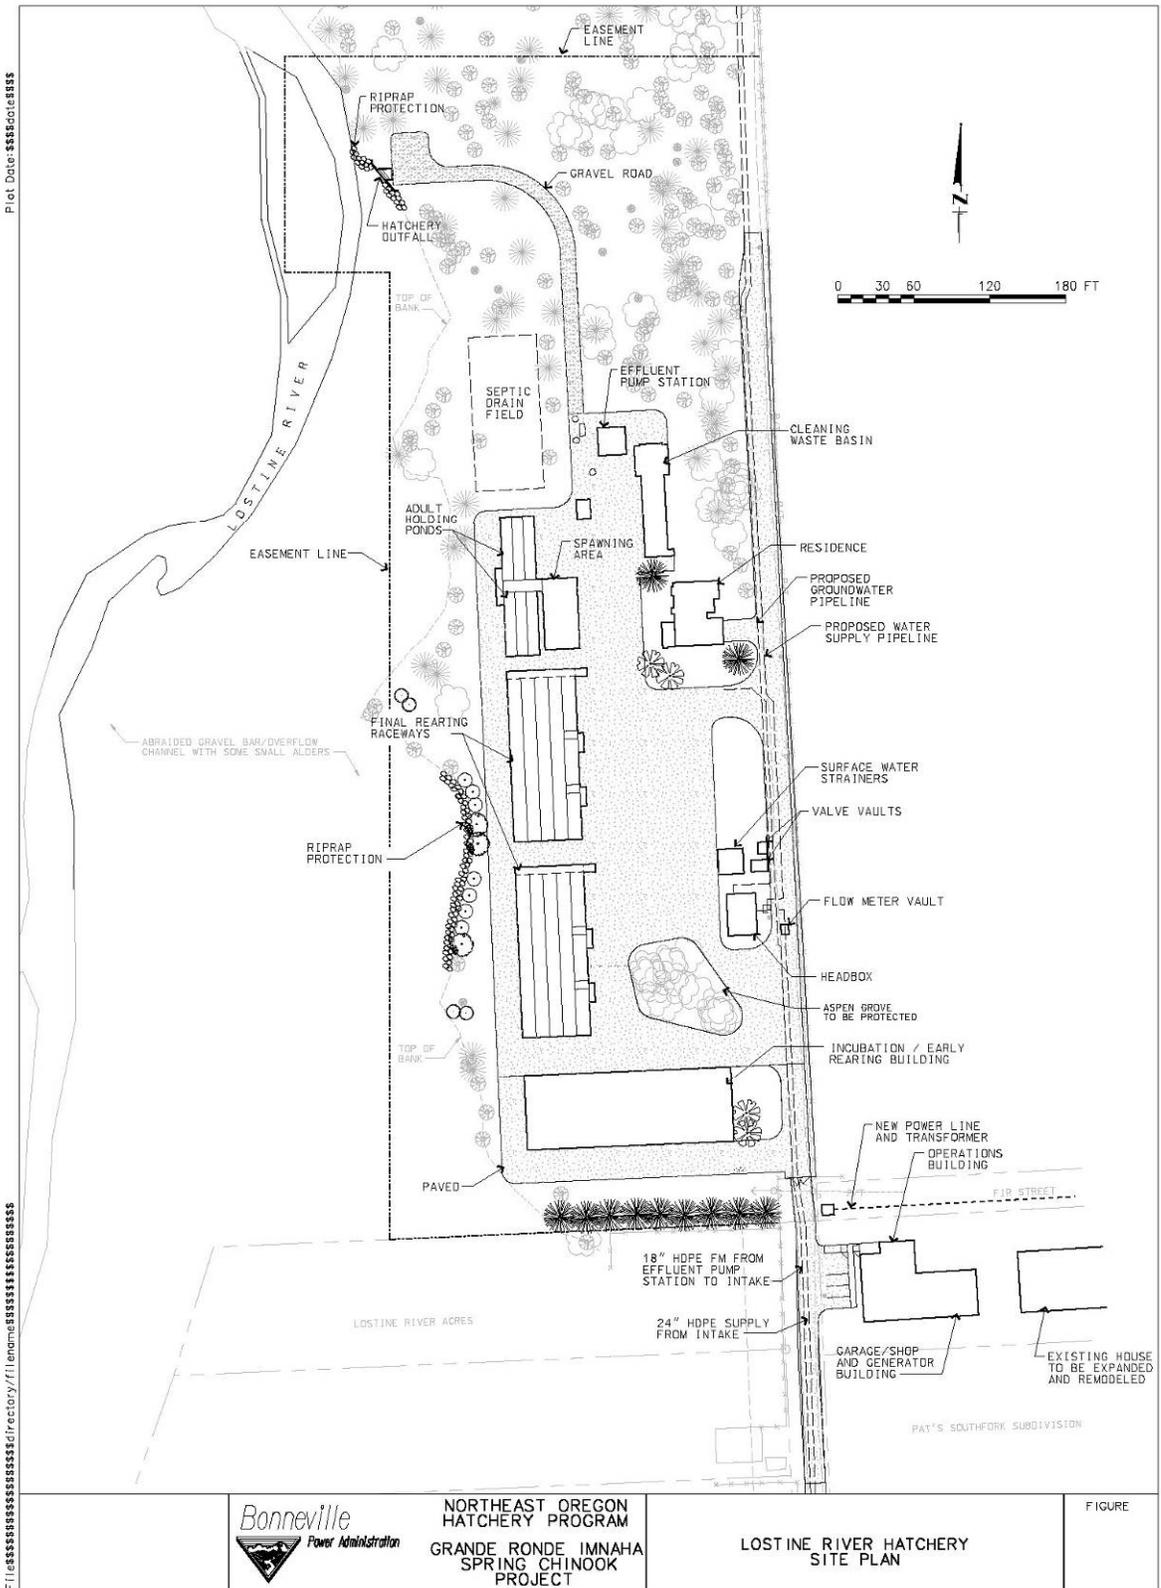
Lostine River Hatchery Site Plan as Proposed in Original BA.
